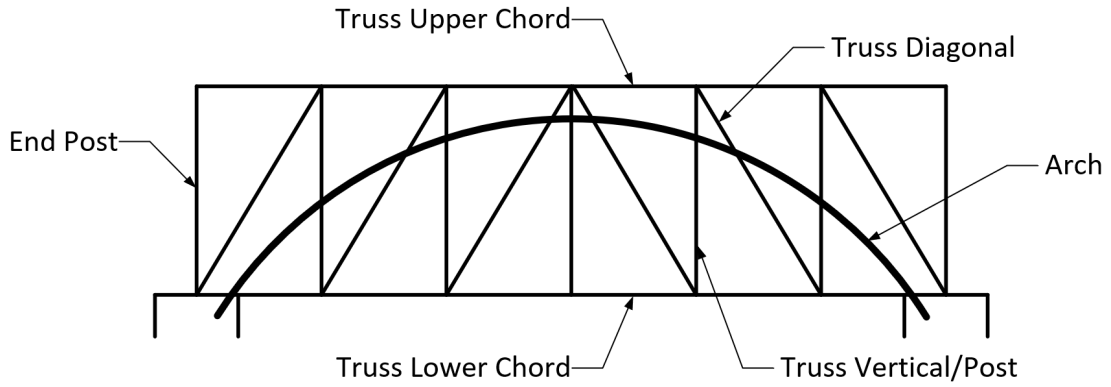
Schematic of Burr Arch-truss Covered Bridge
